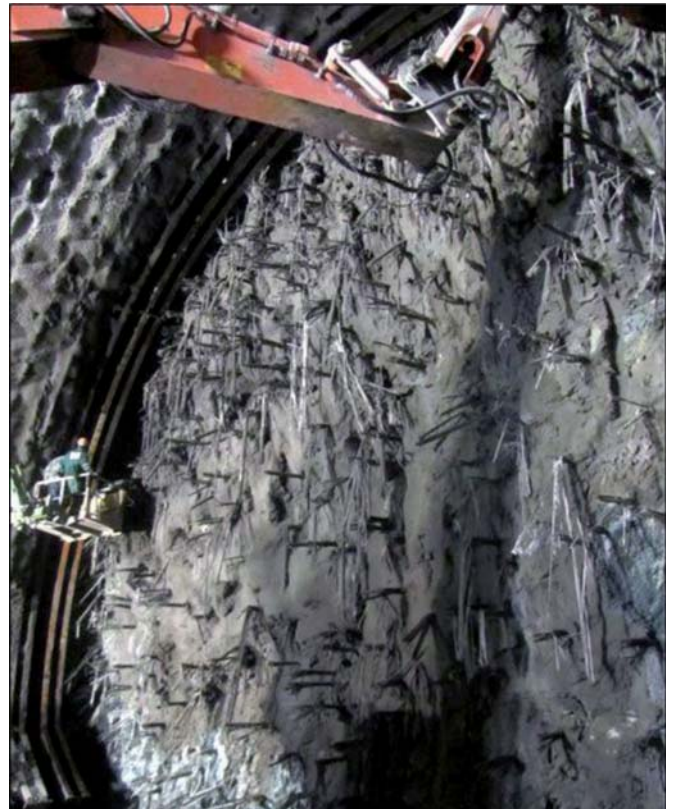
Face of the T8A tunnel – north portal in the landslide area – slope deposits.
